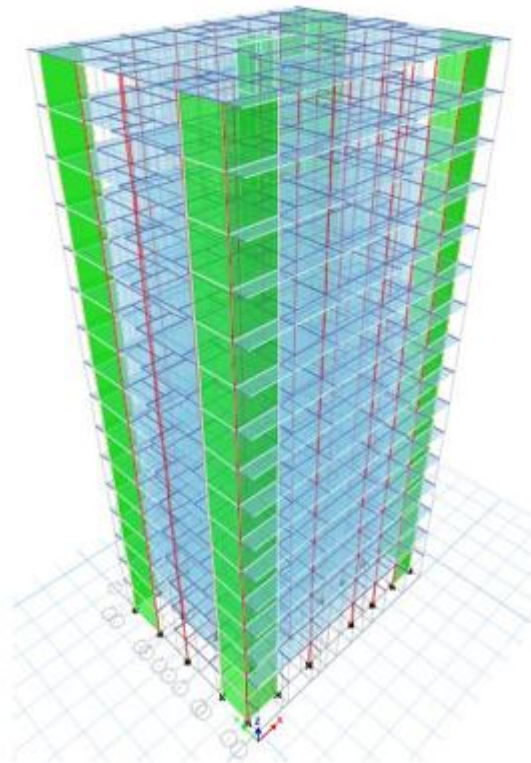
3D Elevation of Regular Structure with corner shear wall
